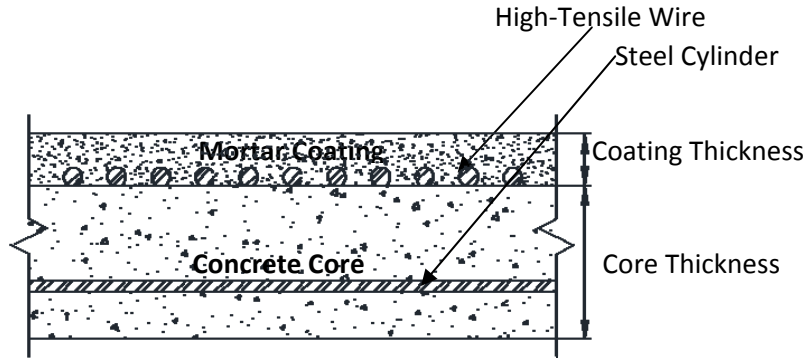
(b) Longitudinal section of wall of PCCP-ECP
